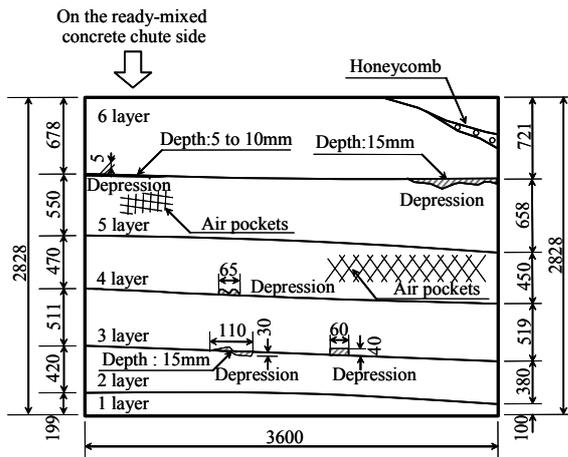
Concrete surface after formwork removal (haunch seen from opposite side)
